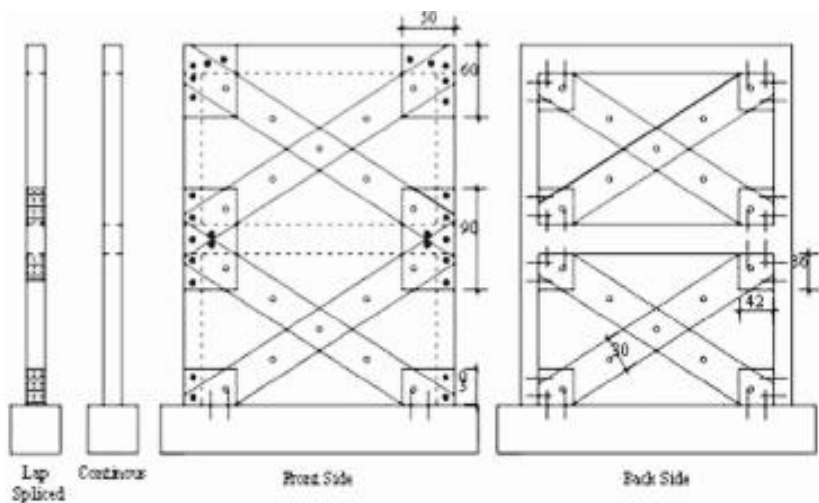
Dimensions and reinforcing details of the specimens (dimensions in mm)
